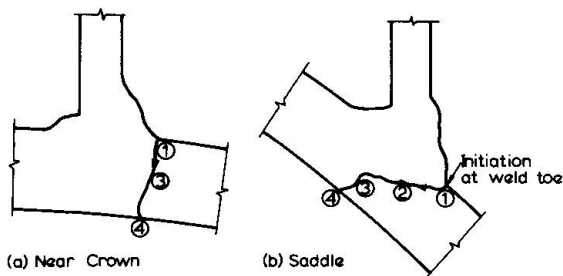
Specimen 1: Through Wall Crack Paths
